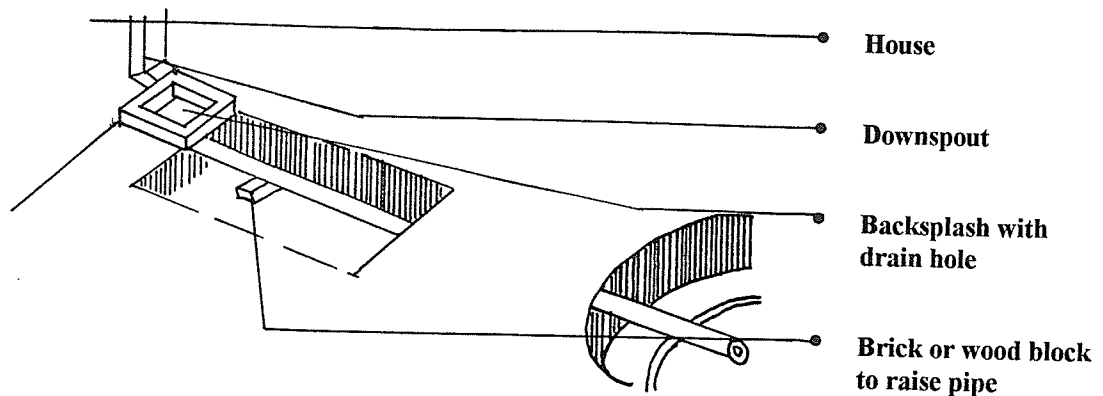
DOWNSPOUT WATER REDIRECTED VIA UNDERGROUND PIPE
